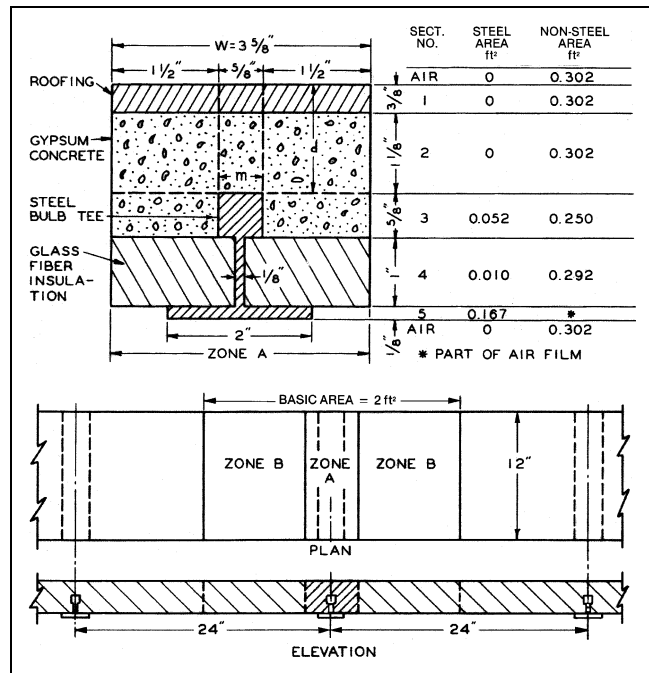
Gypsum Roof Deck on Bulb Tees (Example 4)
